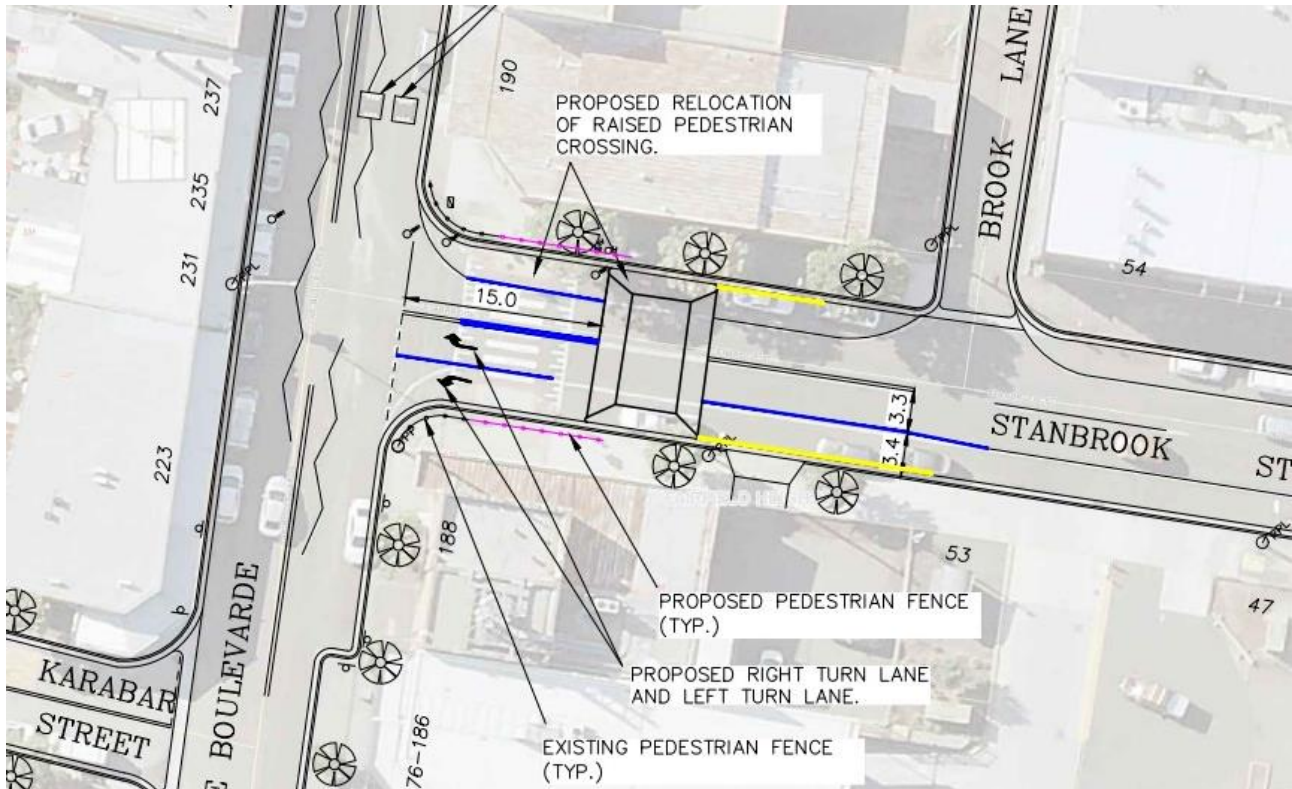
Concept plan for Option 4 Right and Left Turn Bay on Stanbrook Street
